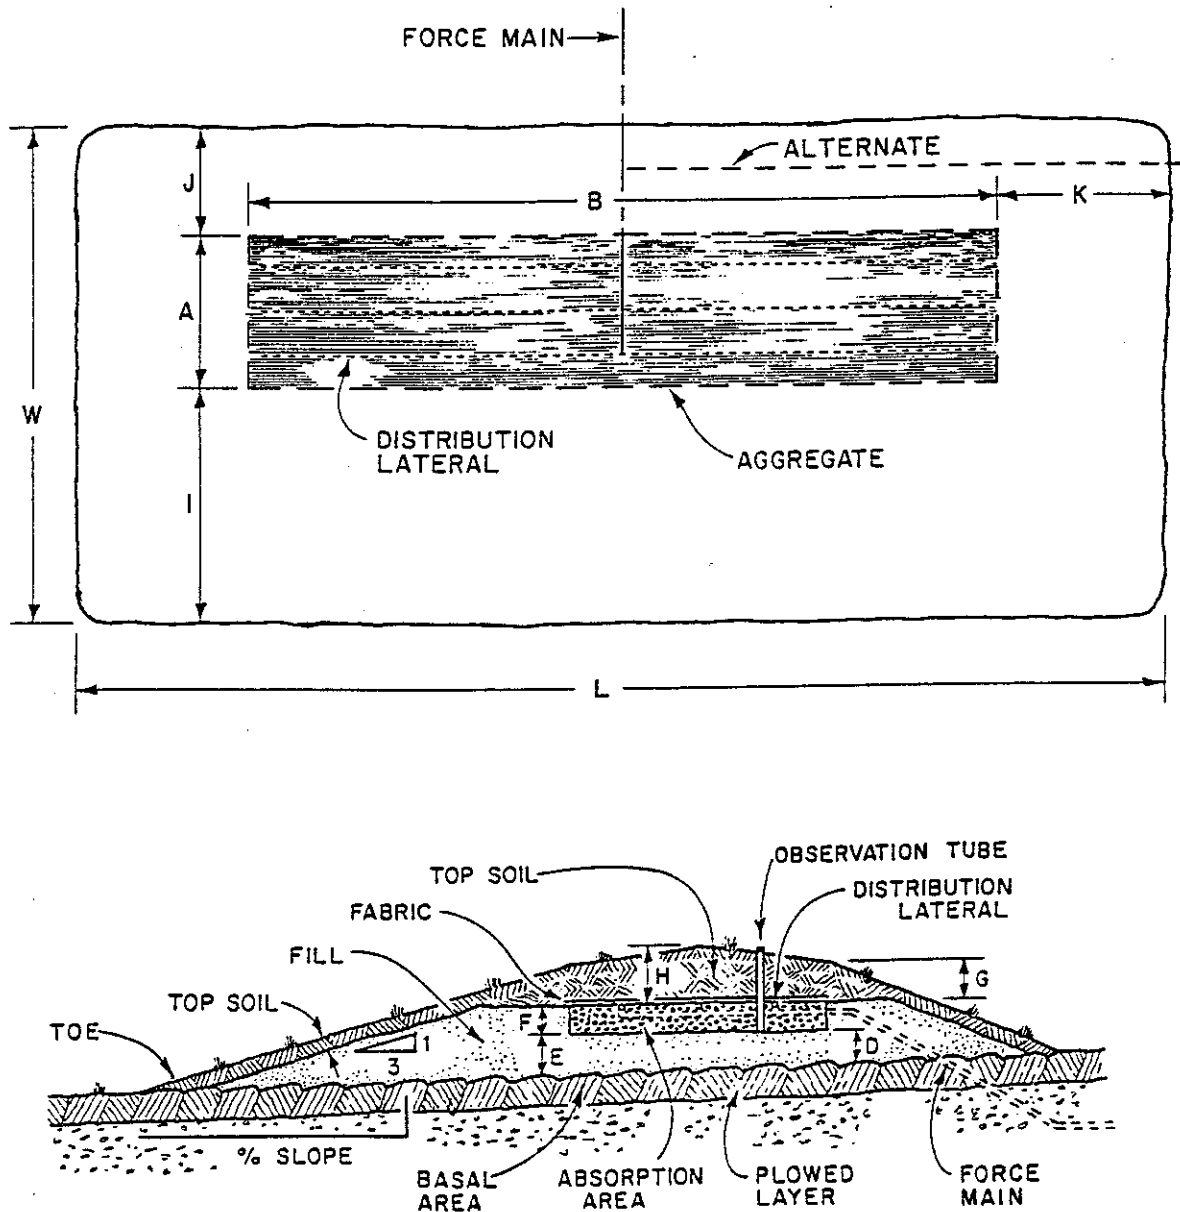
Cross section and plan view of mound soil treatment/dispersal unit.
